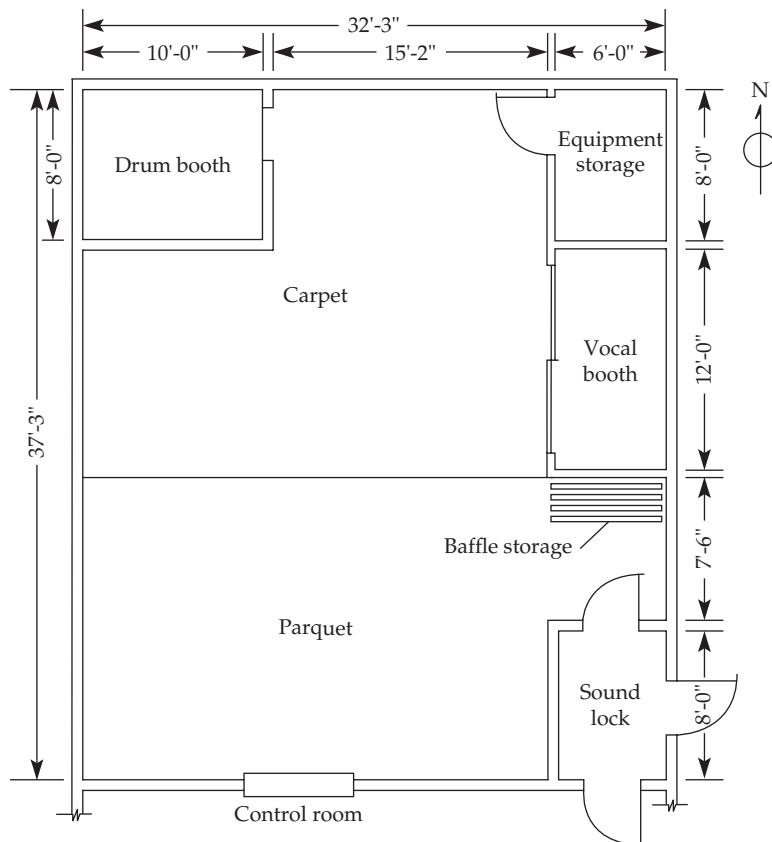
Floor plan of a large multitrack music recording studio.
